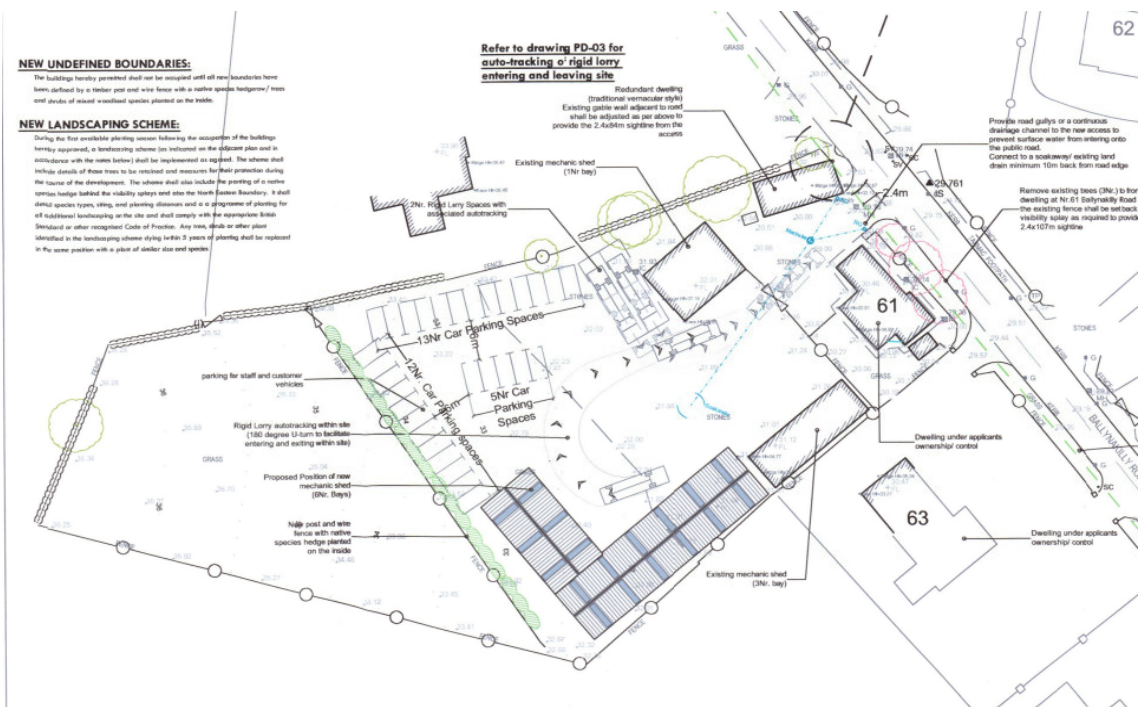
the development which was approved, which should provide bounding to the east of the site however not all of what was approved was evident on site yet. See Photo 1 below.
